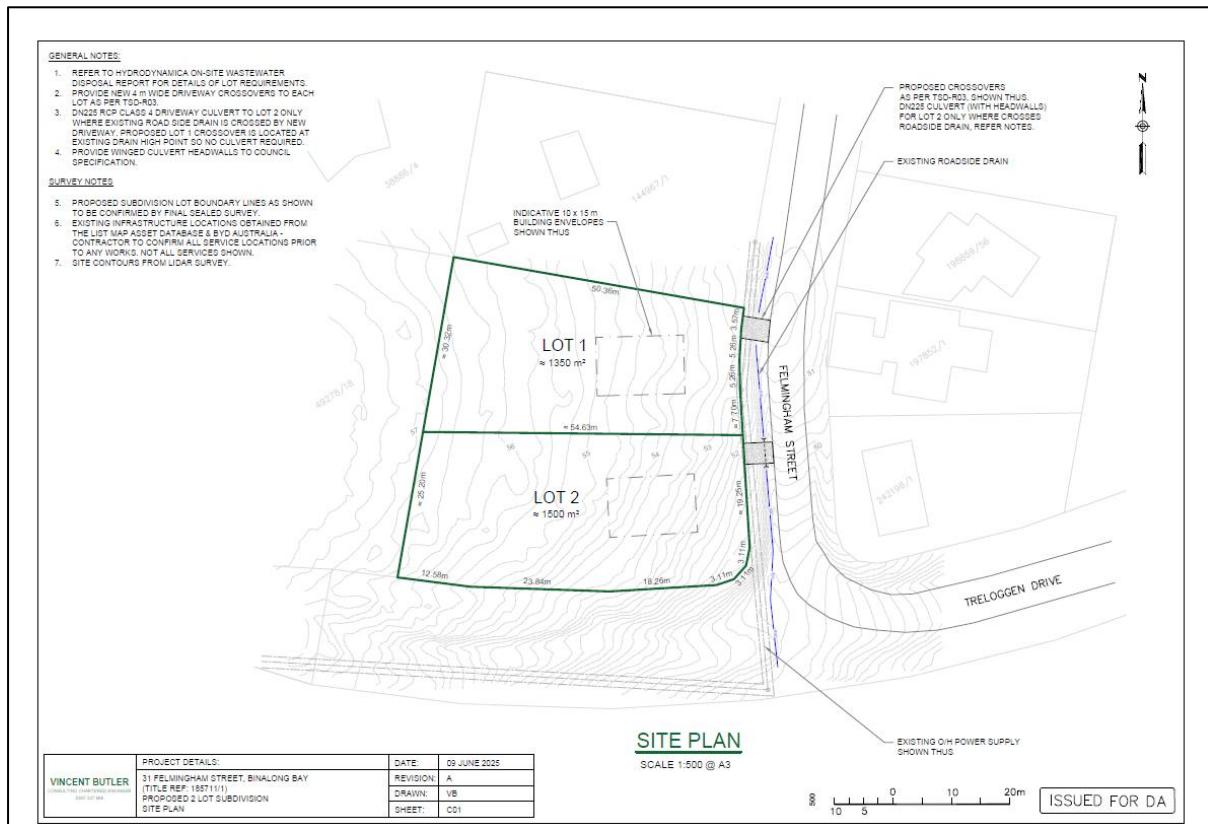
EXTRACT OF SITE PLAN SHOWING LOTS TO BE CREATED AS WELL AS INDICATIVE BUILDING AREA, AND EXISTING SERVICE LOCATIONS.
